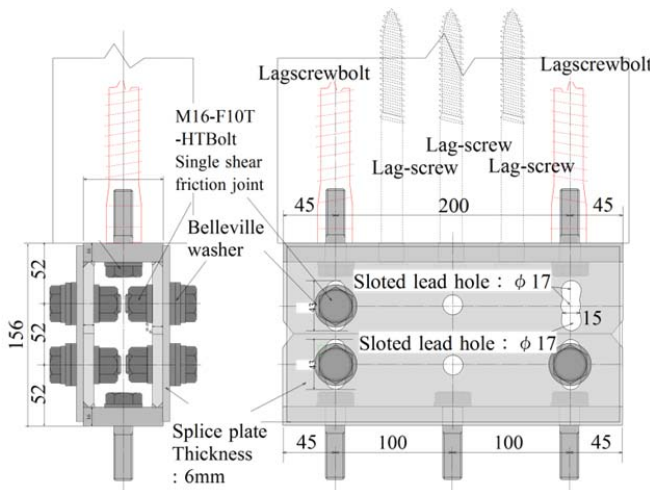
(a) and (b) show details of beam-column and column-leg joint, respectively. In both joints, 9mm thickness SS400 steel was used to make U-shape main element and 6mm thickness SS400 steel was used for slotted splice plates. Main U-shape steel element and slotted splice plates were assembled with F10T-M16-High Tension Bolts accompanying with double Belleville
